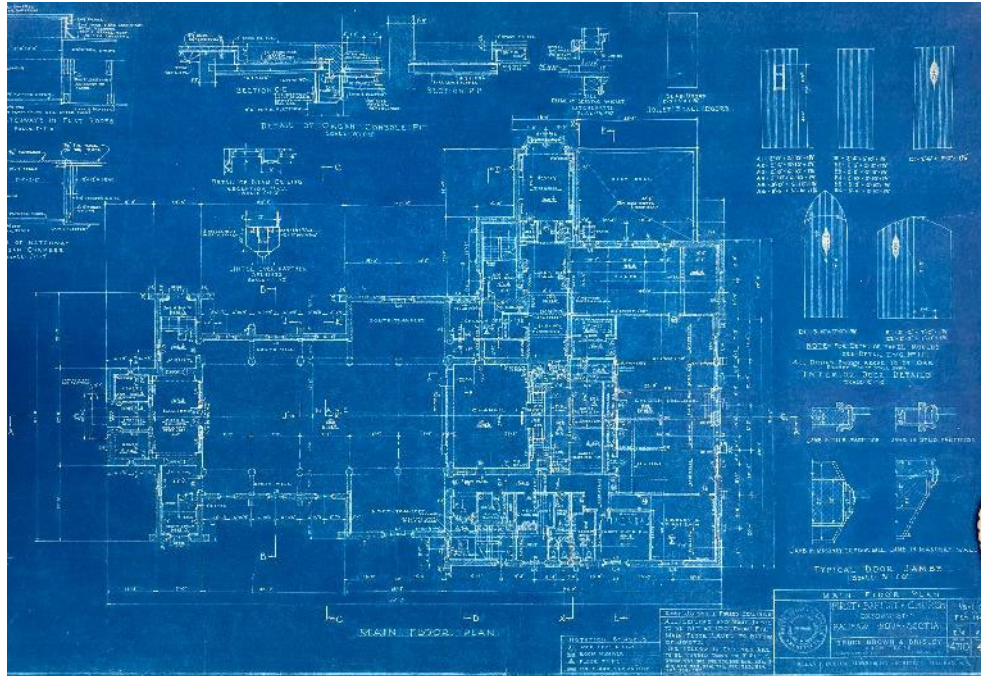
Main Floor Plan of First Baptist Church, Bruce Brown & Brisley, 1948-1949<sup>7</sup>
